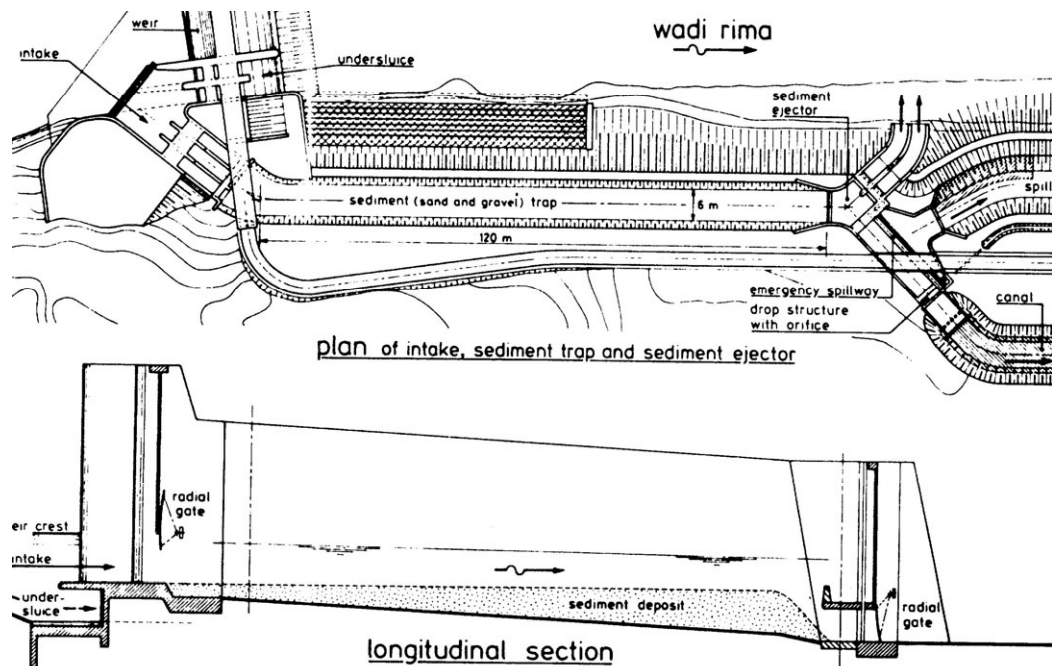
Plan of Wadi Rima intake and sediment settling basin.
